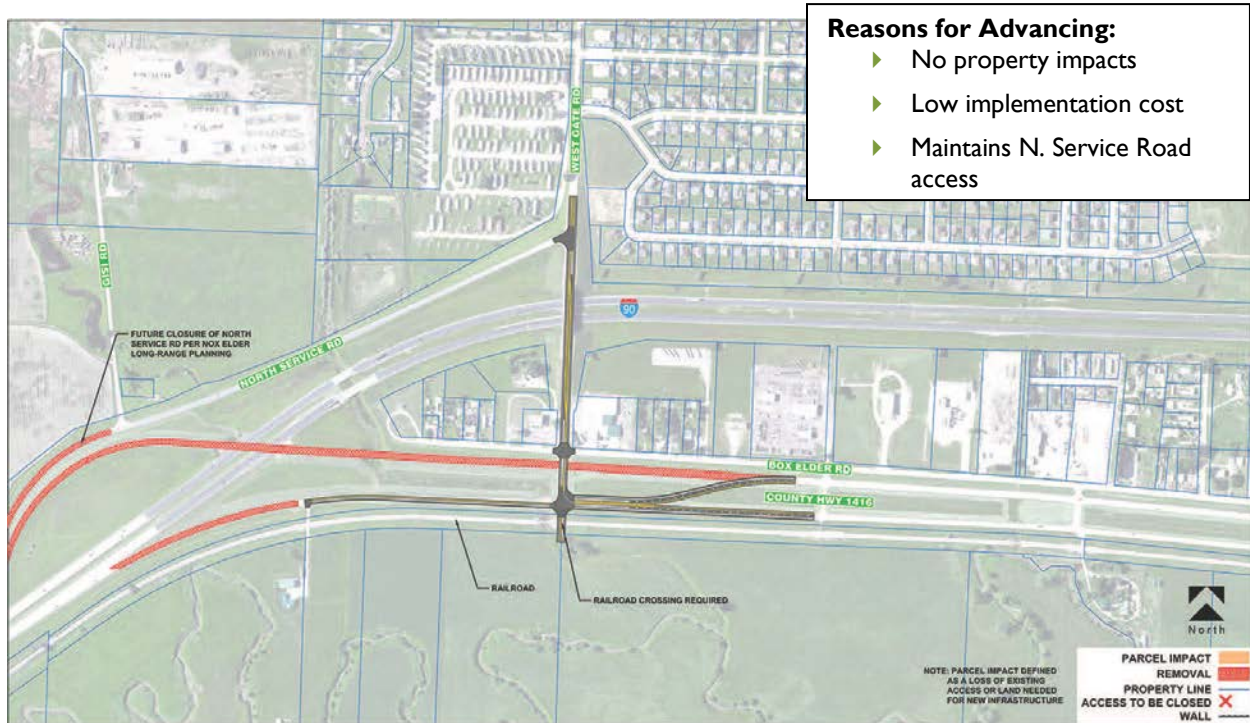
Alternative 3. Interchange at West Gate Road with Existing West Ramps and New East Ramps
